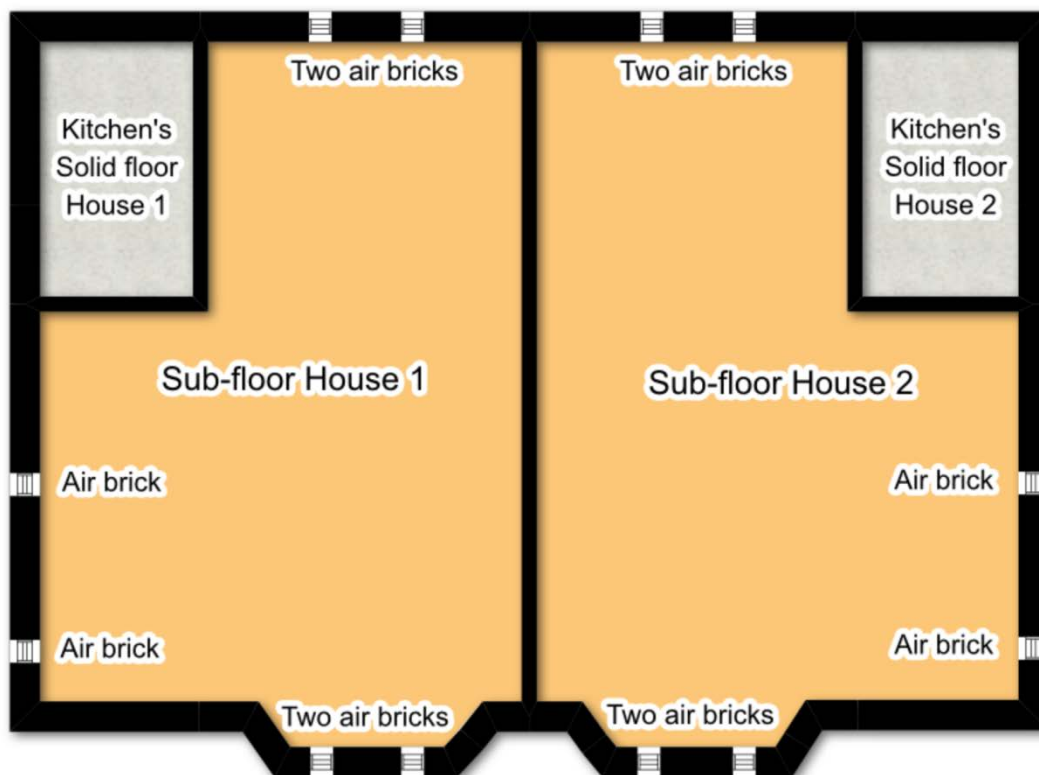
Floor plan of the ventilated subfloors existed below the ground floor of each house and the location of air bricks
